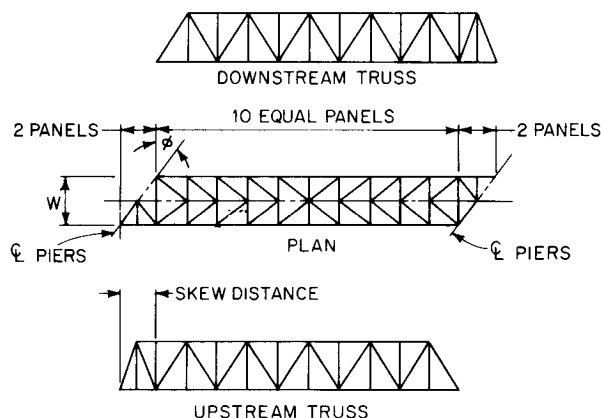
Skewed bridge with skew distance exceeding panel length.
